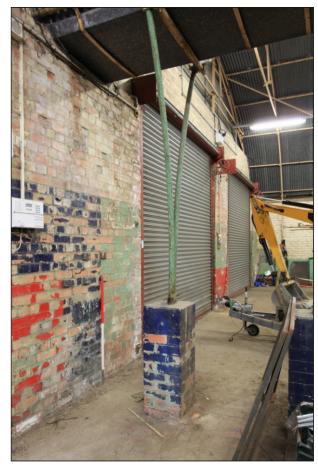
Detail of a typical pier showing the steel arches within the tank garages (Romney sheds)
